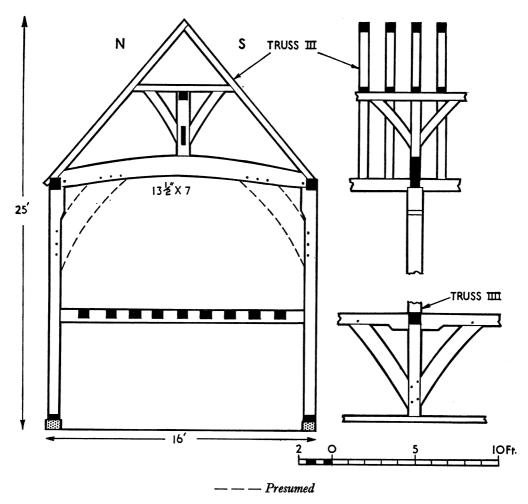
Middle Farm, Harwell. North Wing: Section through Truss III and Elevations from N.
